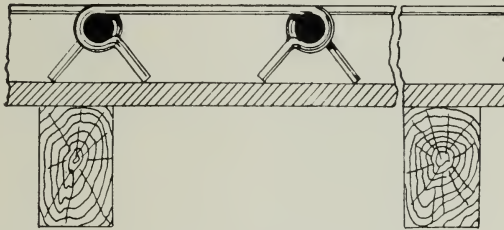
Rods and Stool-lock Spacers for Concrete Floor Slabs.
